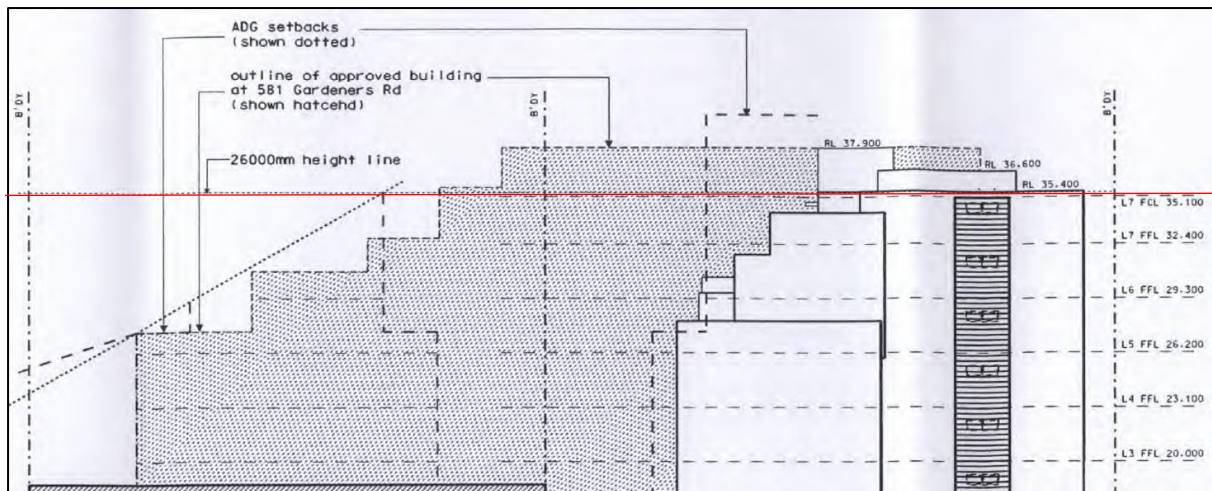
East elevation extract of No.563 Gardeners Road with height line shown in red
